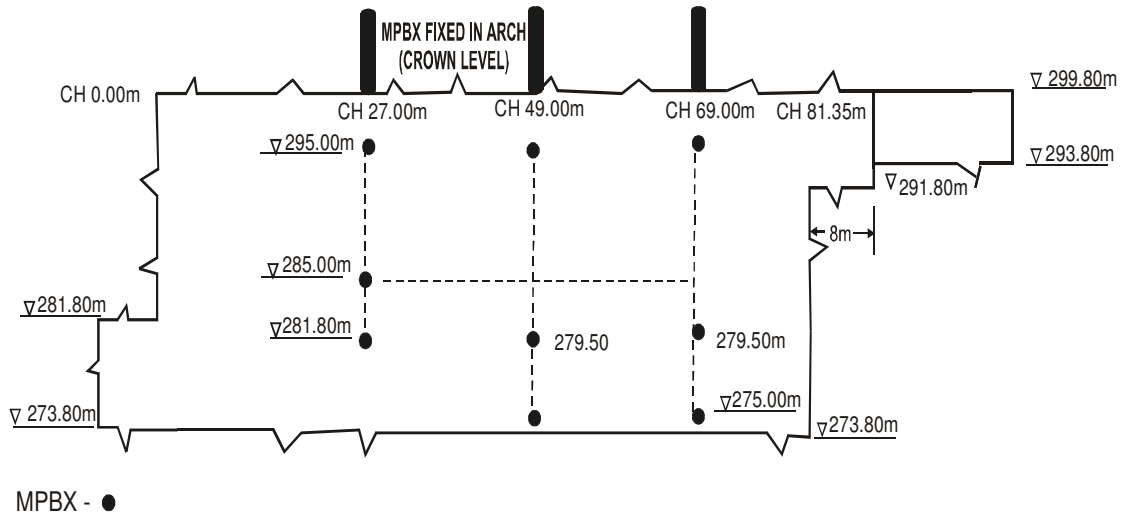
Longitudinal section of Transformer hall showing downstream wall with instrument locations and cable layout
